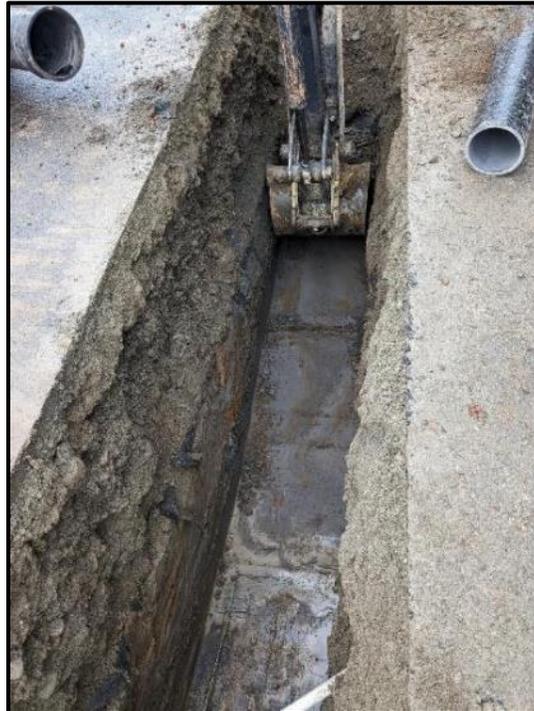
Photo of excavation activities with soil variations evident on trench floor, plan view.
